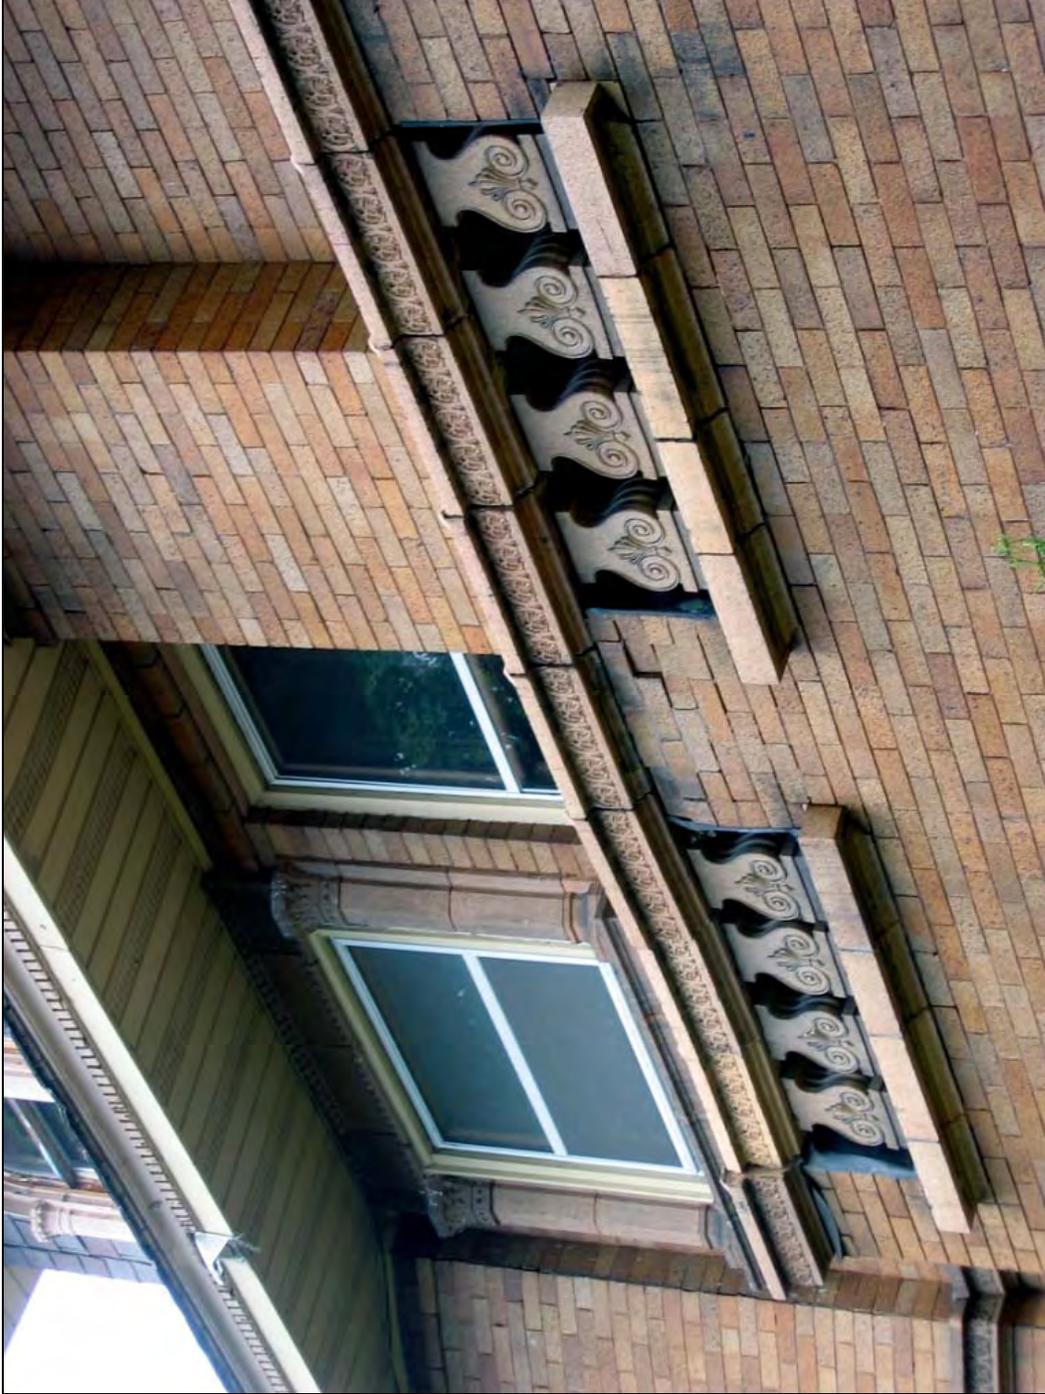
South elevation, terra cotta details, 2010, Source: Bob Glancy
